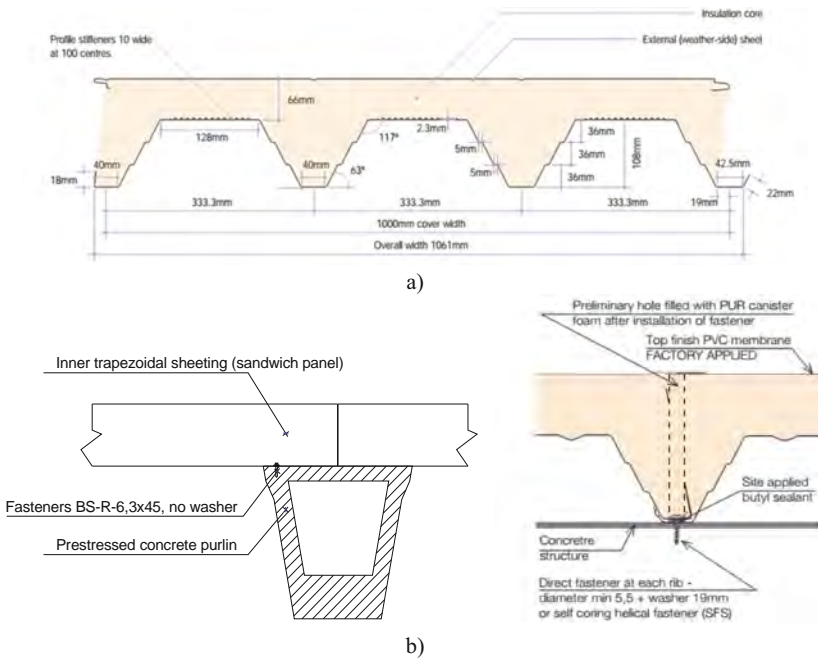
Details of the purlins and roof to purlin connection: a) roof panels; b) detail with panel support on prestressed concrete purlins, transversal (left) and longitudinal (right).
